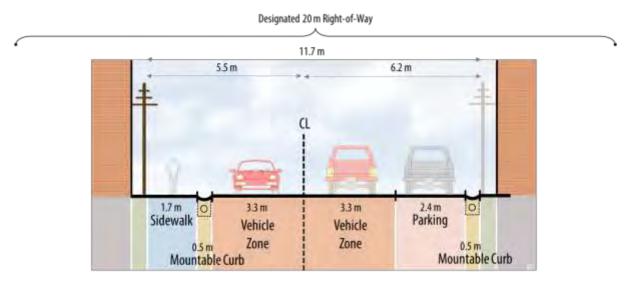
11.7 m Platform Semi-Rural Cross-Section with Sidewalk and Parking for Belfountain Village (Bush St. to Community Centre)
